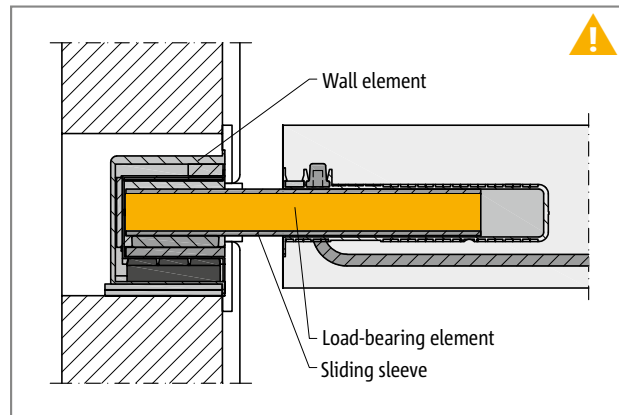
Schöck Tronsole® type Q: Multi-part product (wall component, load-bearing component, sliding sleeve); load-bearing element (yellow) must be installed on the building site.
